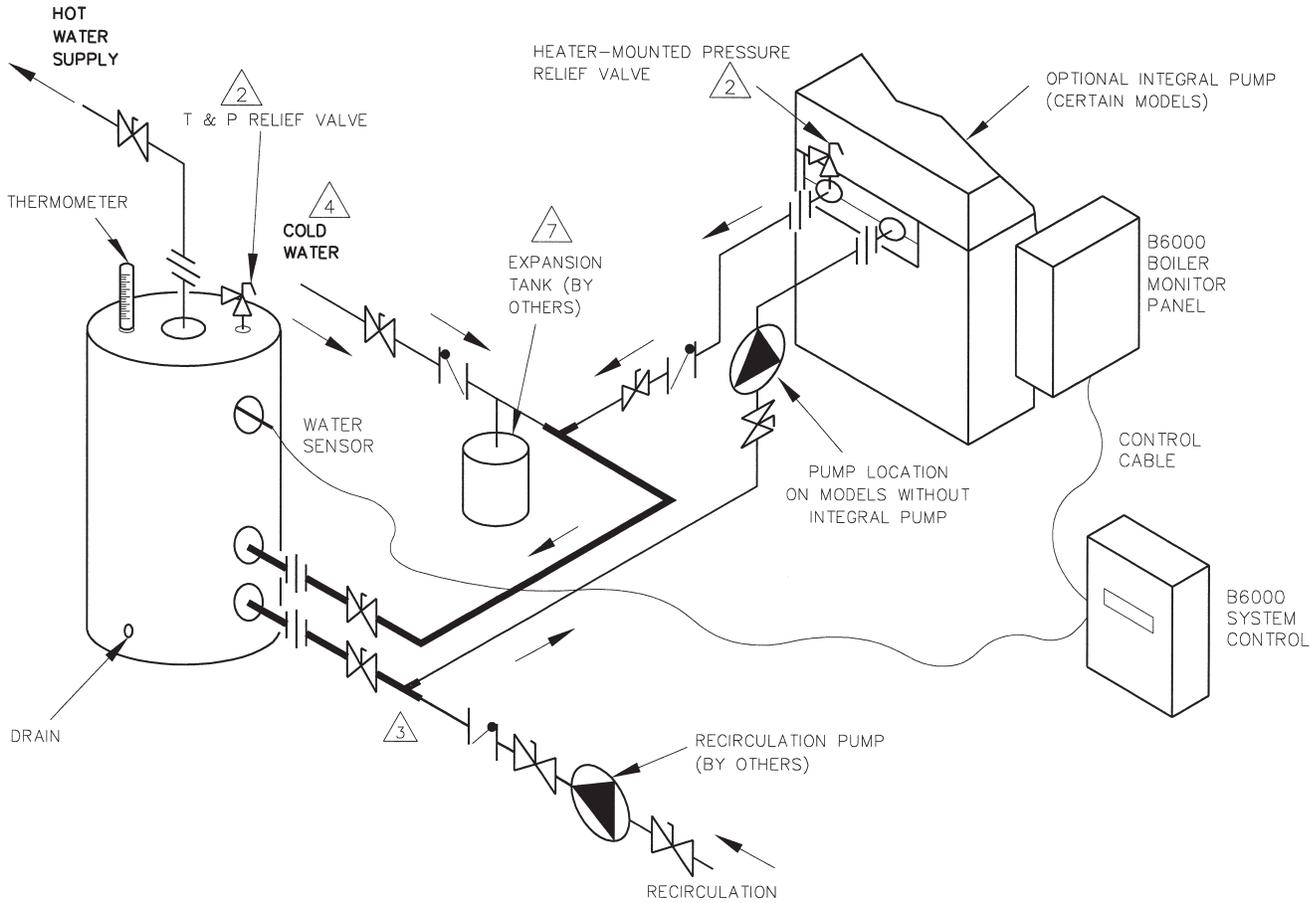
Typical Piping (Piping Layout May Vary Per Specific Application)
